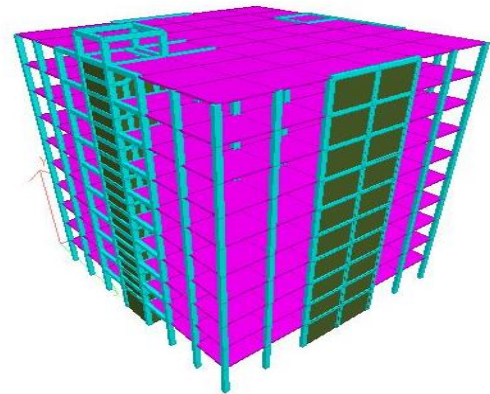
D VIEW OF FLAT SLAB WITH SHEAR WALL IN Z DIRECTION.
